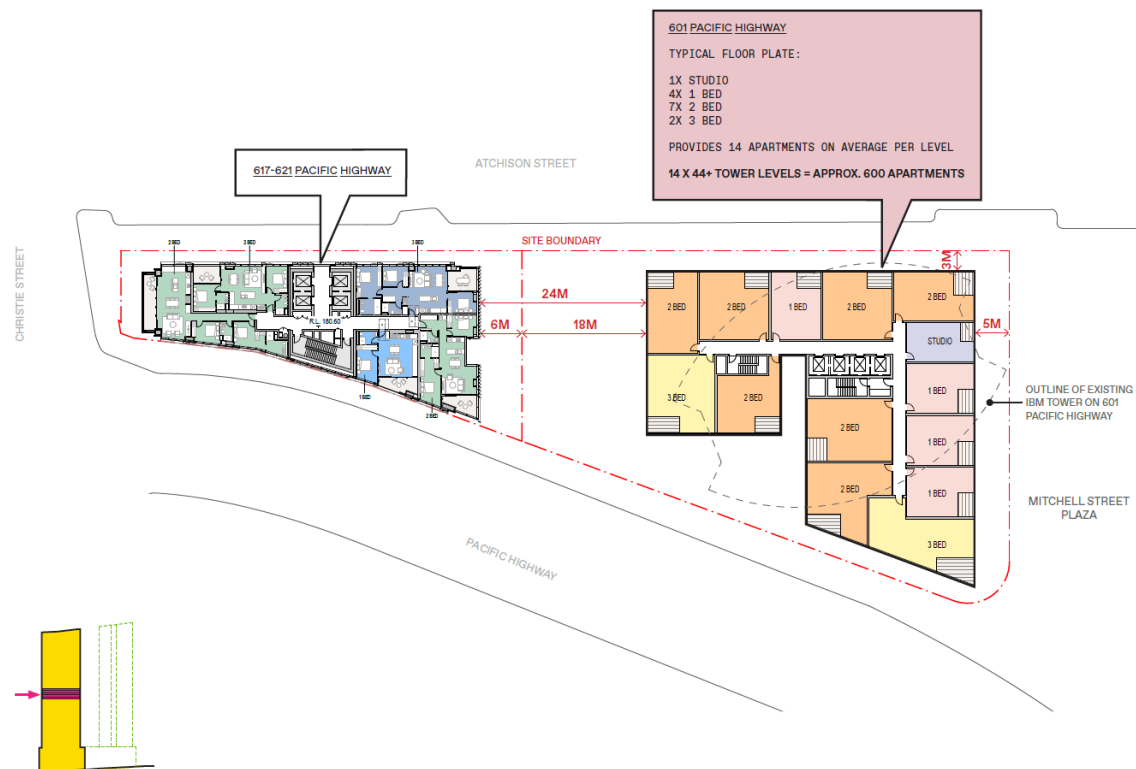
Indicative Floor Plan – 601 Pacific Highway (Source: BVN Architects)
